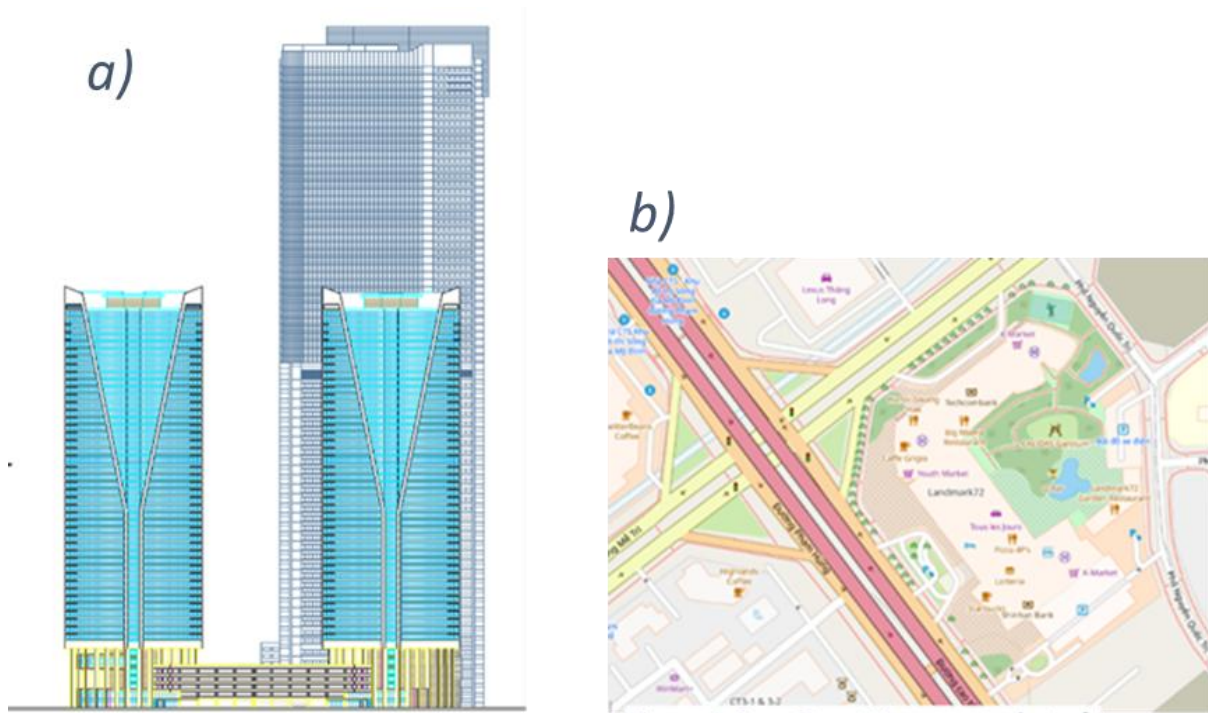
a) AutoCAD architectural plan of the Keangnam Tower;
